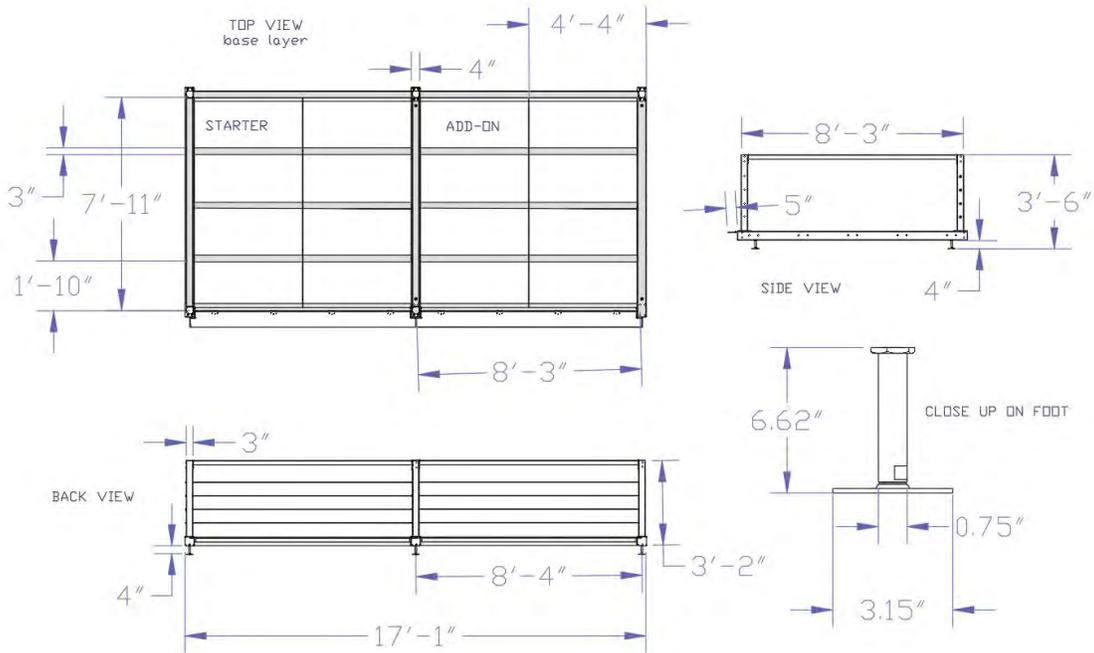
CAD drawing of top view wheelchair accessible parklet layout
